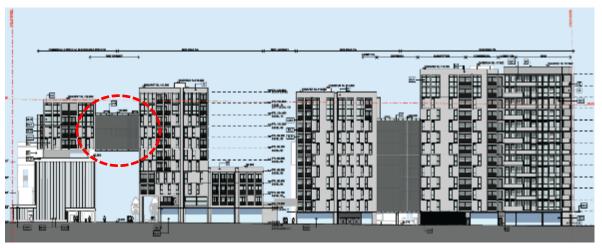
Rutledge Street Elevation (Plan 1502, Revision 1)
